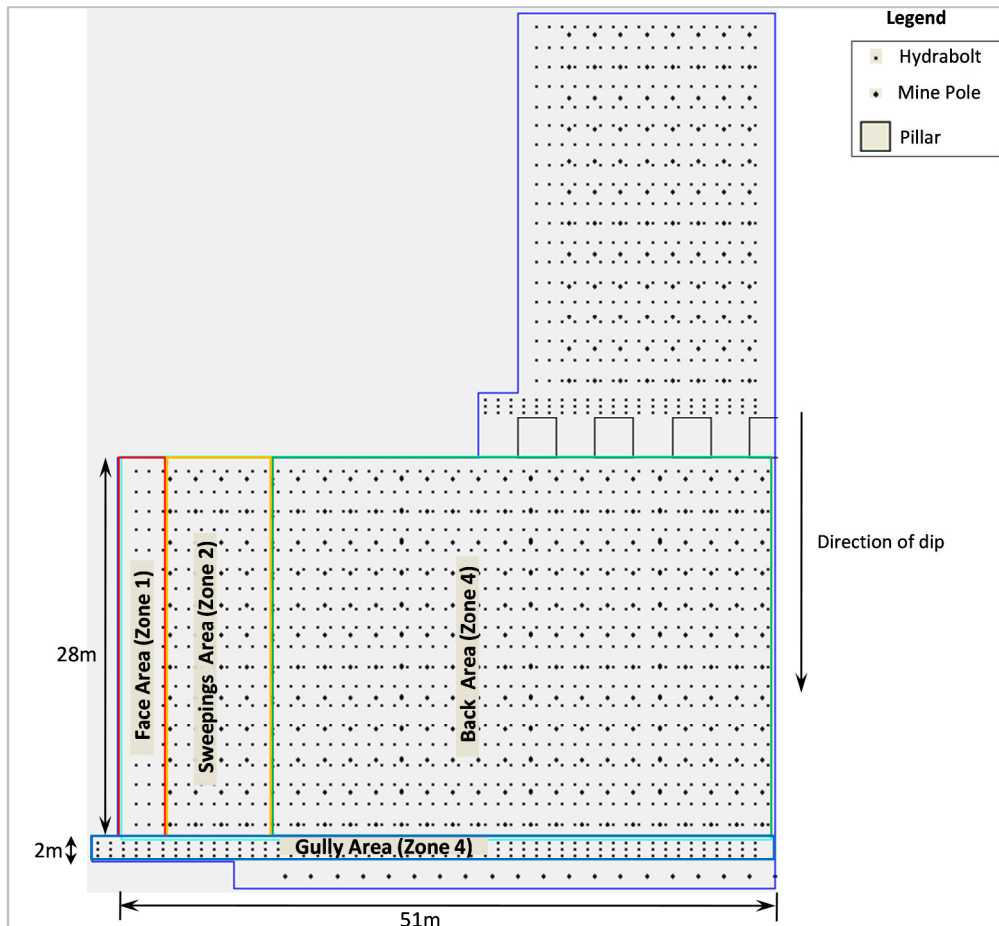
JBlock image of the excavation and support layout for Merensky reef
